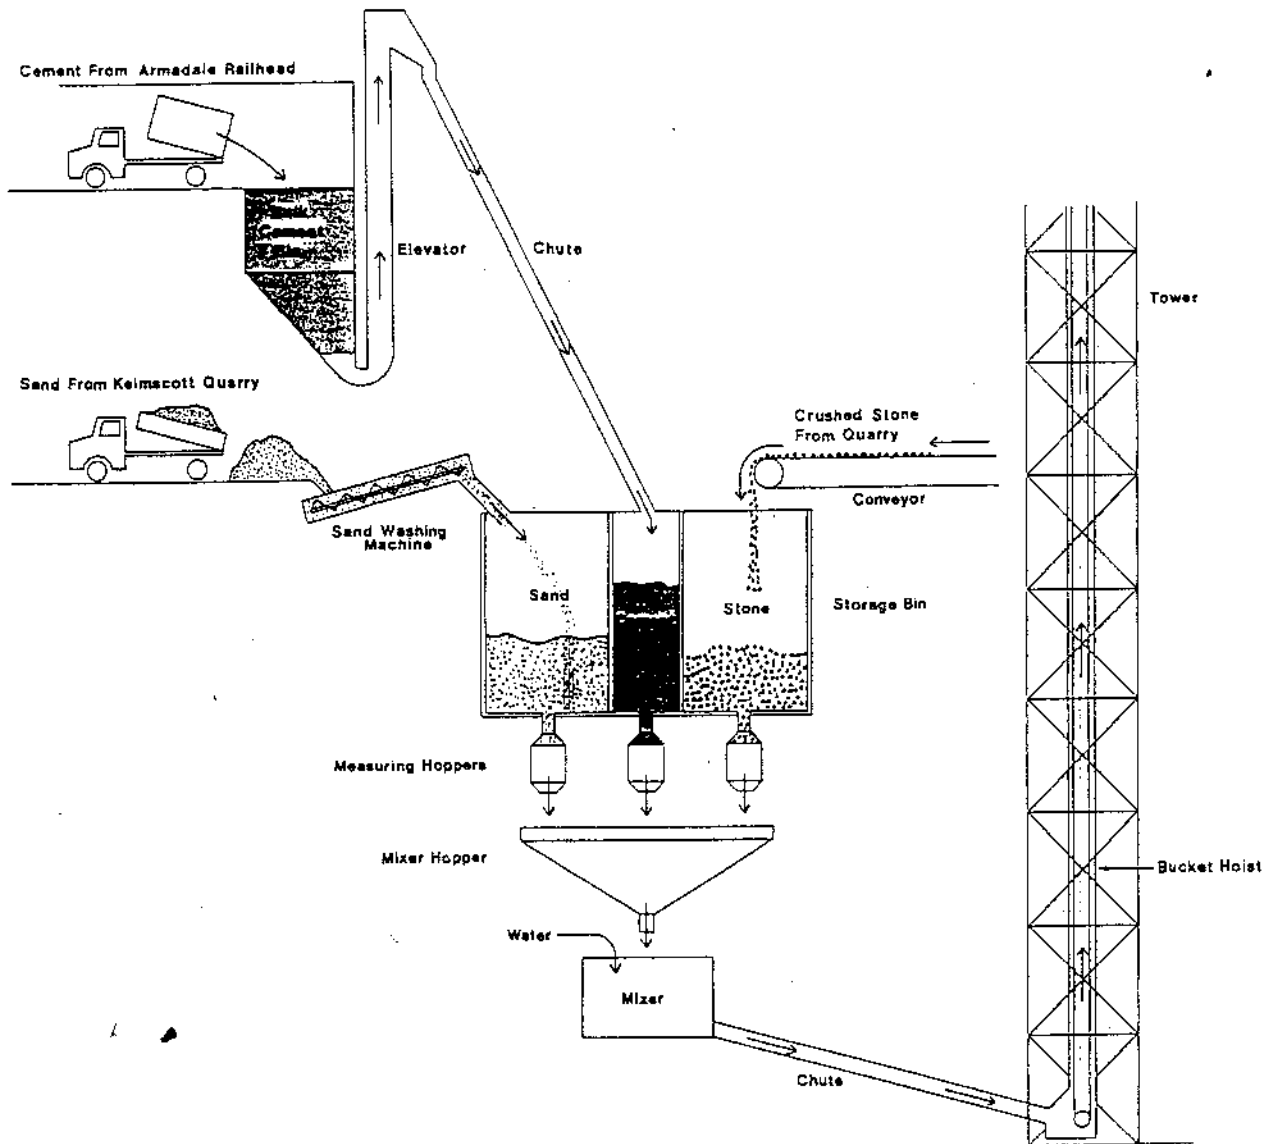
Figure showing process of mixing concrete in the early stages of construction. (Later sand washing was abandoned, the cement handling altered and the crushed stone added in two sizes)
